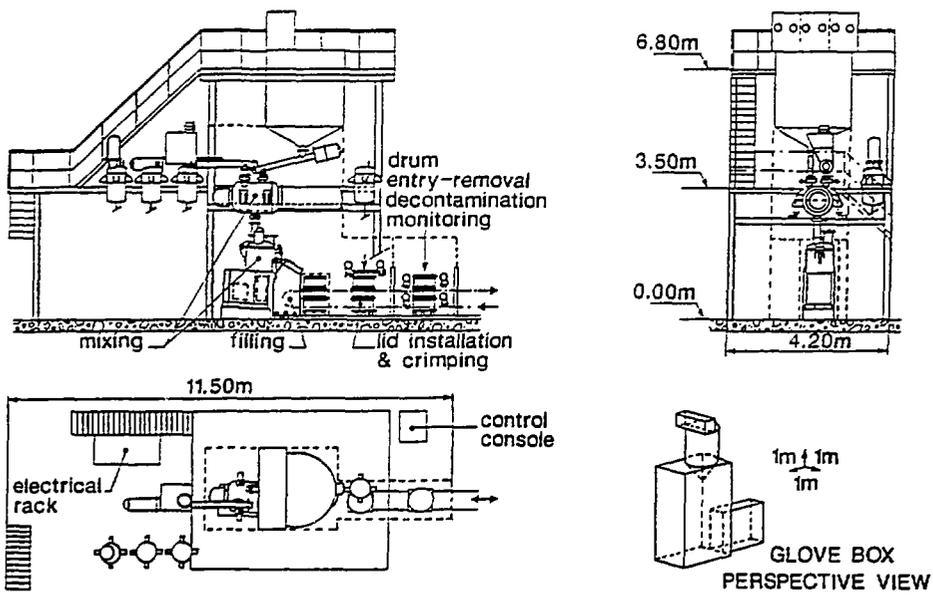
CEMENT-RESIN EMBEDDING PROCESS LAYOUT
